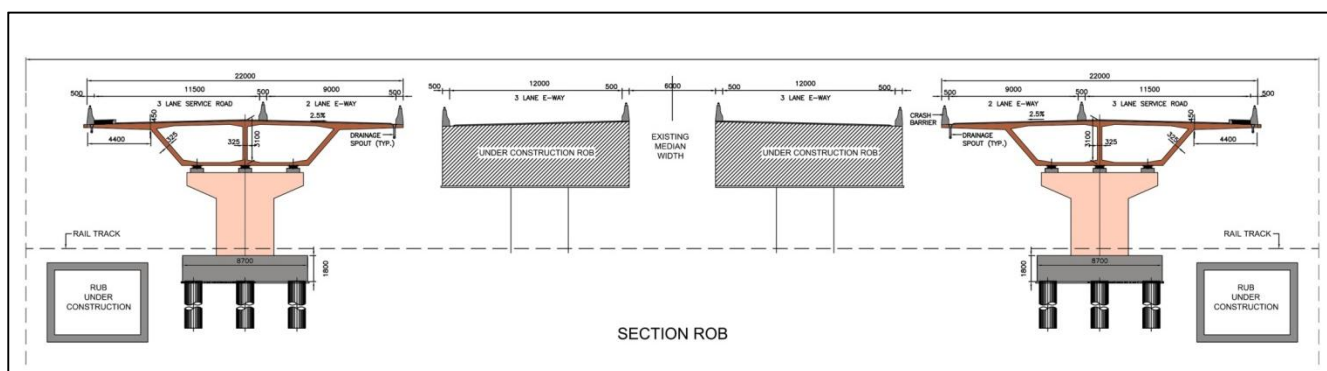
Typical Cross Section at RoB (Chainage Km 20.600)
